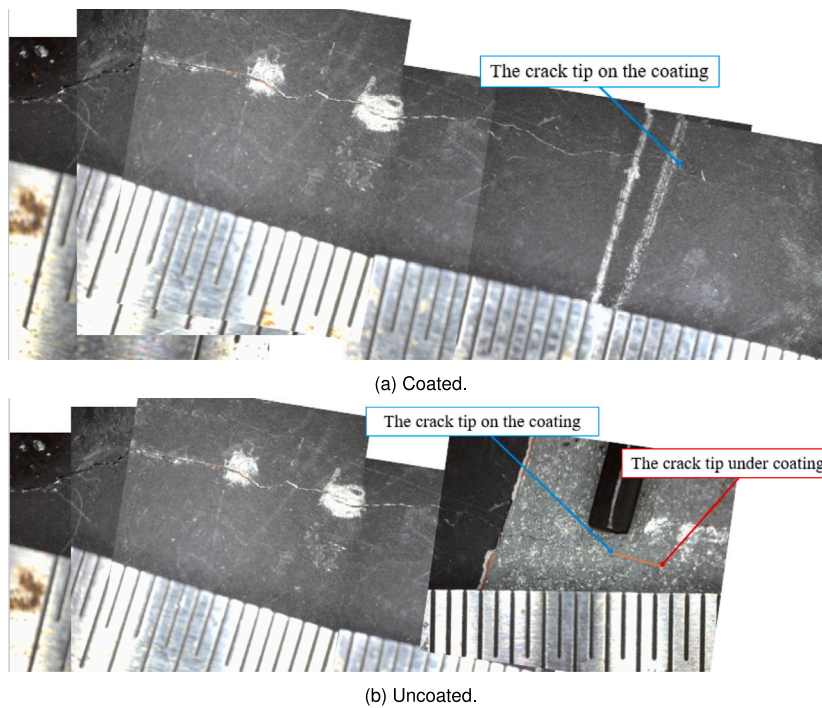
Right crack: Crack tip location on the coated plate before and after removing the coating.
